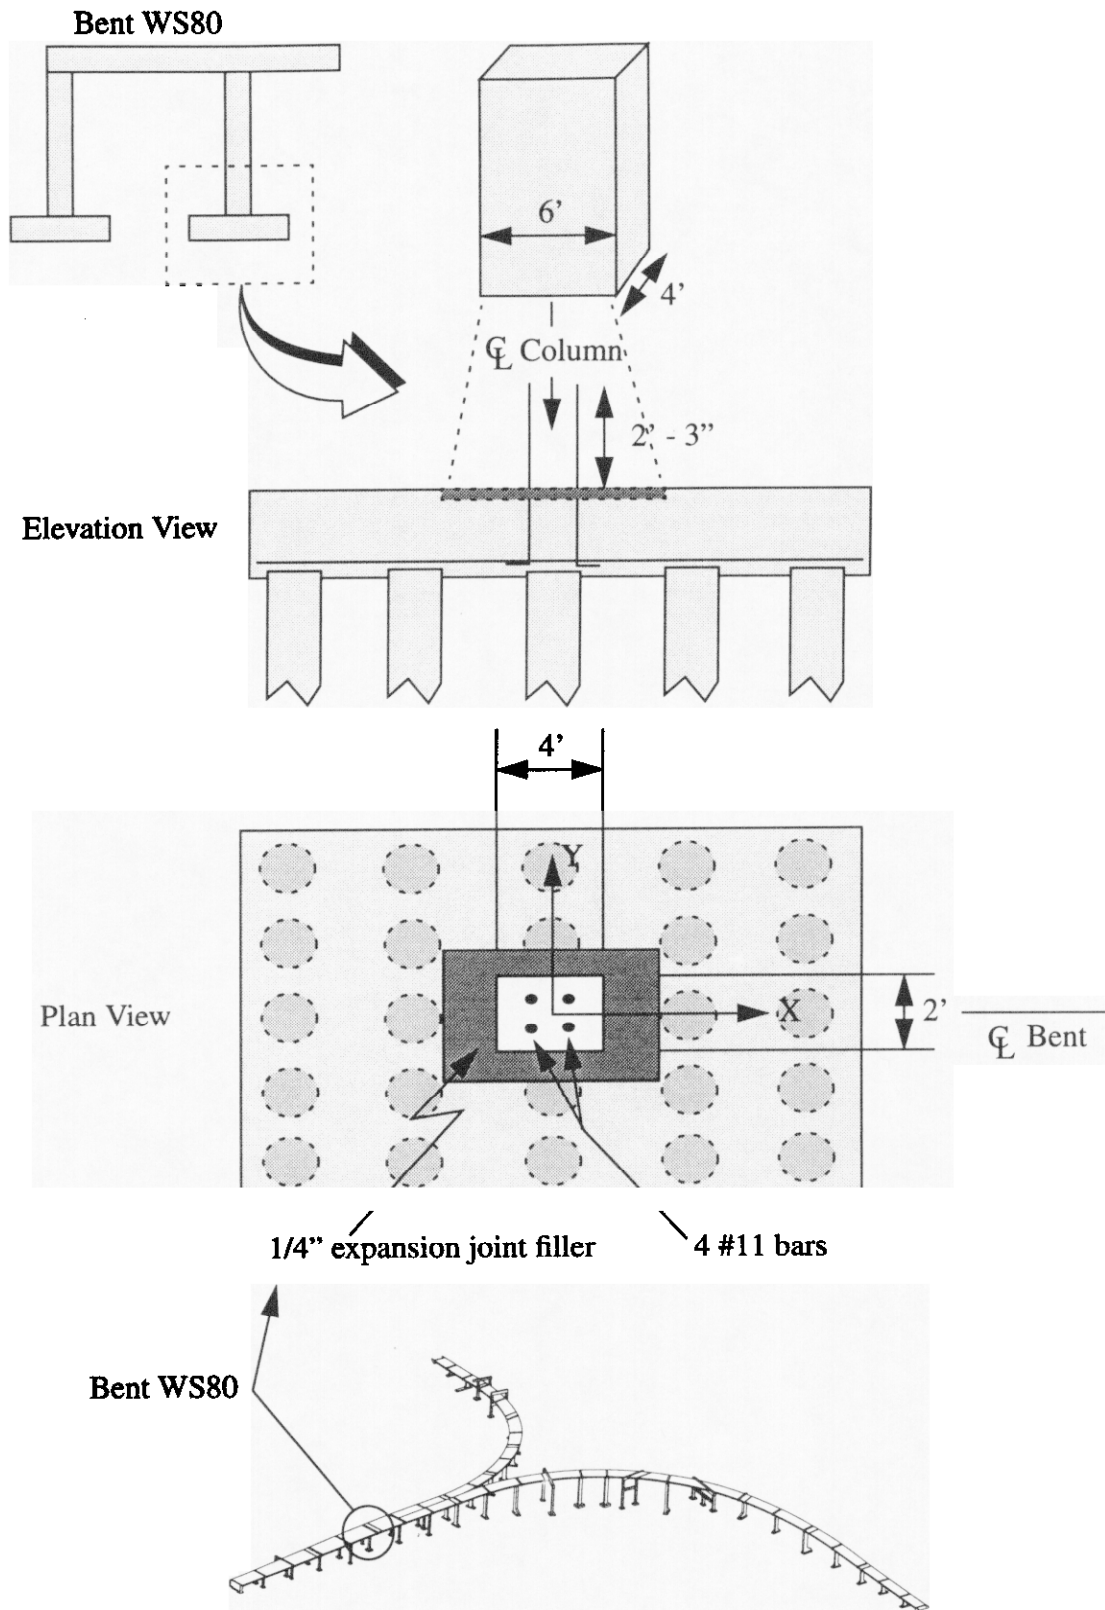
As-built construction details for pinned columns (multiple column bent).
